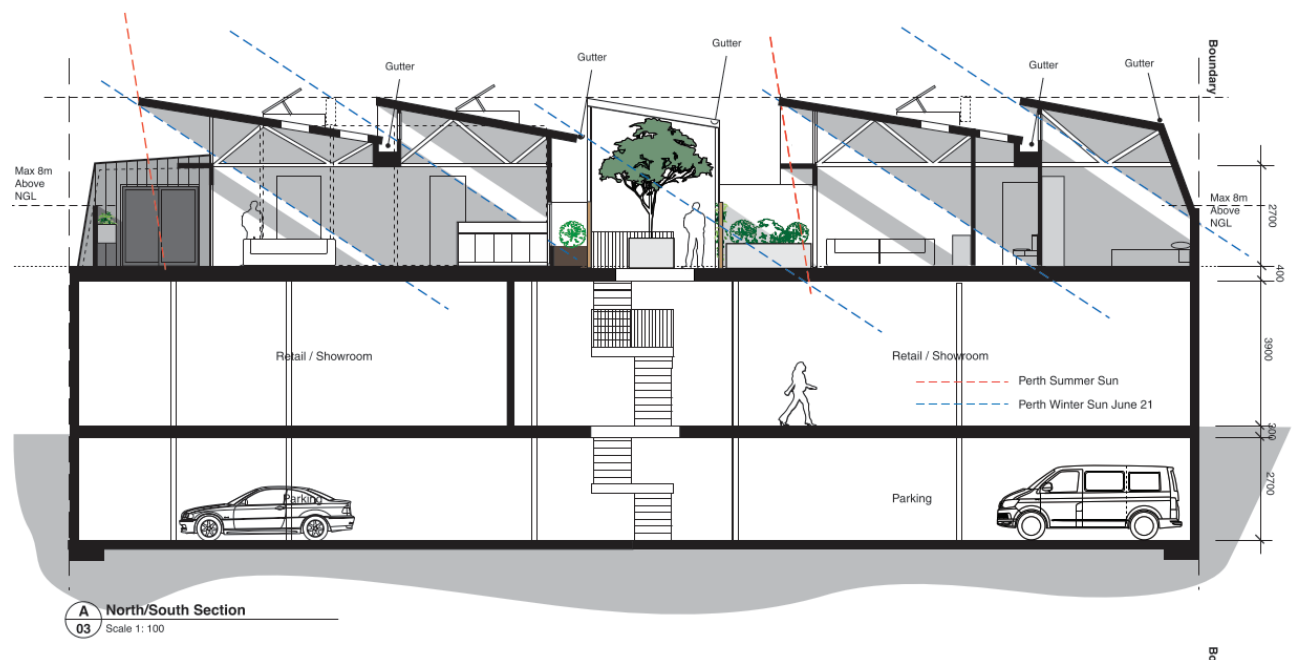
Amended Plan cross section demonstrating winter/summer solar access
